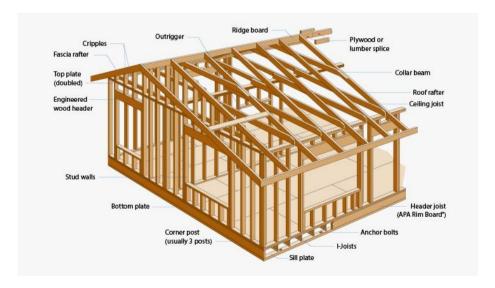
Timber Frame of a House (WaFdBank, n.d.).
